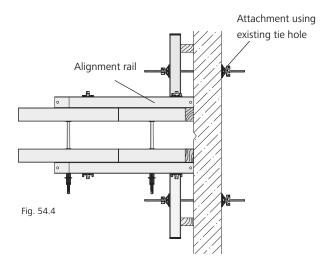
and 54.4 show various options for connecting formwork to an existing wall. Depending on the wall layout and conditions on the construction site, the most suitable solution may vary from case to case.
